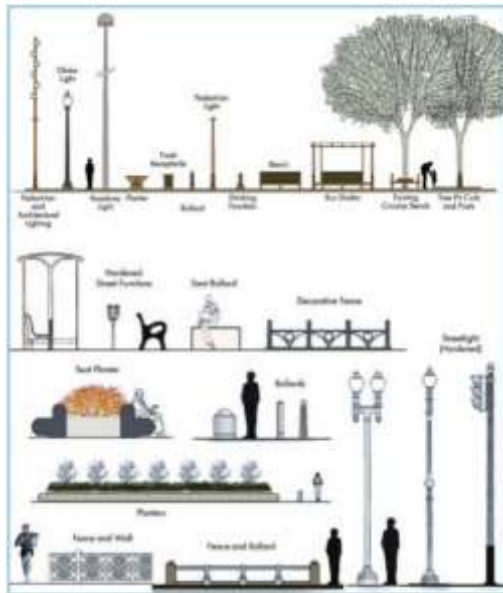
Streetscape elements suitable for hardening as security elements (Source: National Capital Planning Commission, 2002)
